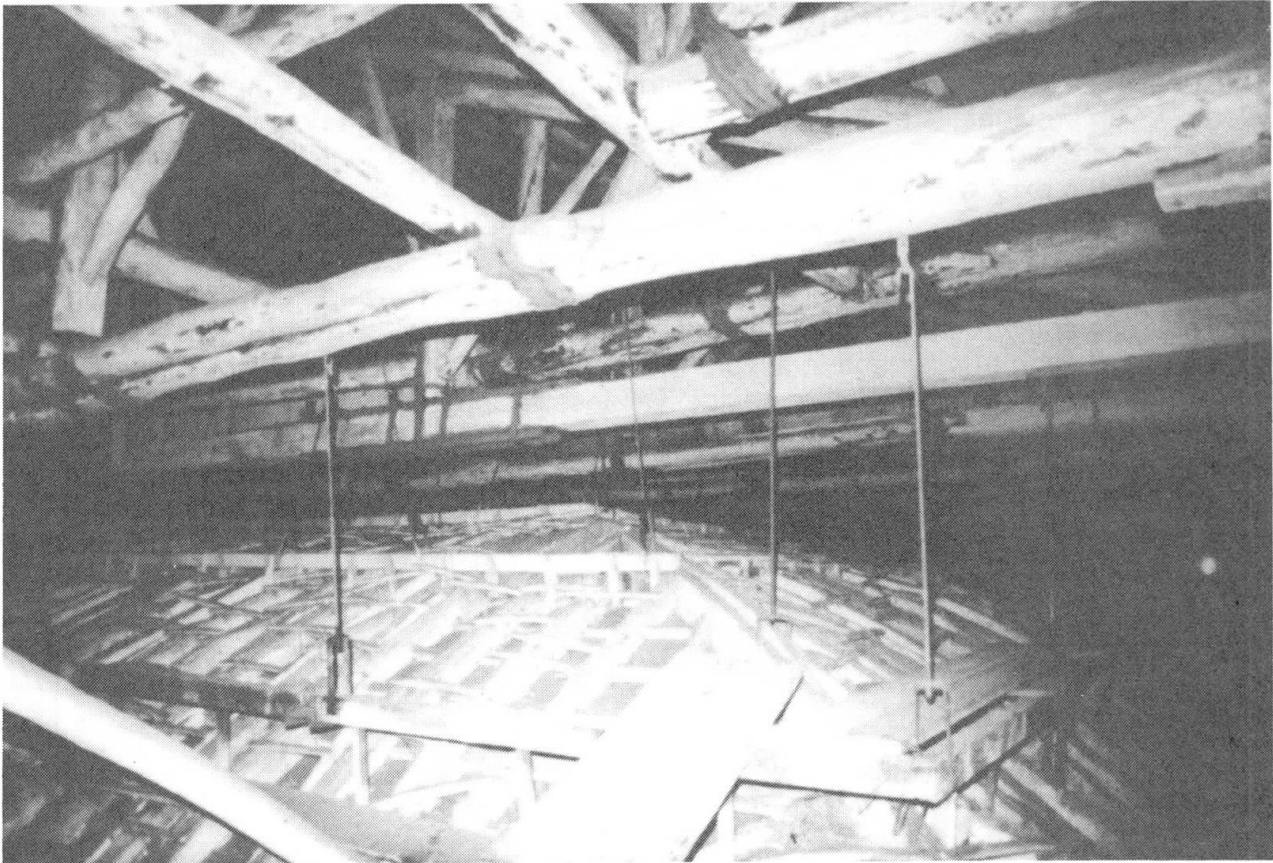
Inner structure of wooden covering: lower trusses and depressed wooden vault with stiffening ribs before intervention.
